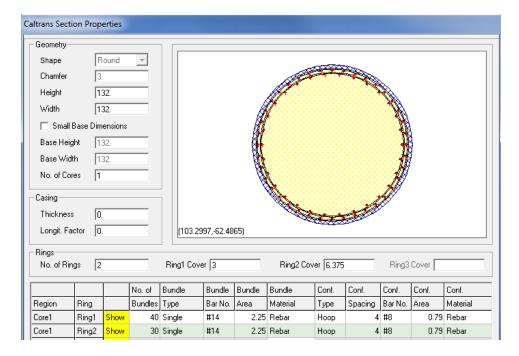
Section Properties – Dutch John Cut Bridge 11-Foot Truss Column
